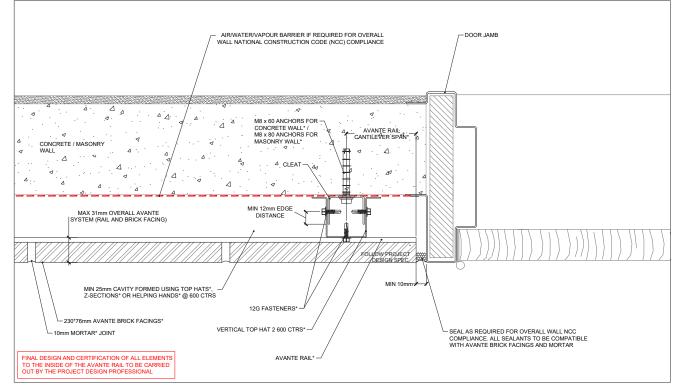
Avante door jam detail. The detail for concrete/masonry substrates will be identical except that the vertical supports must be in accordance with 2.4.5.
